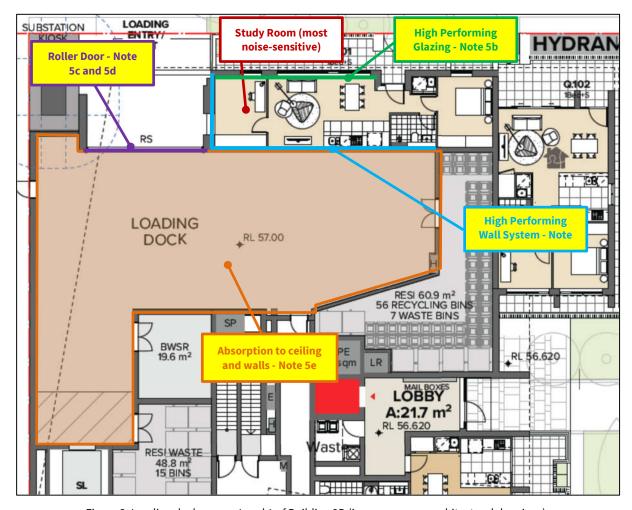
Loading dock was on Level 1 of Building 2D (image source – architectural drawings)
